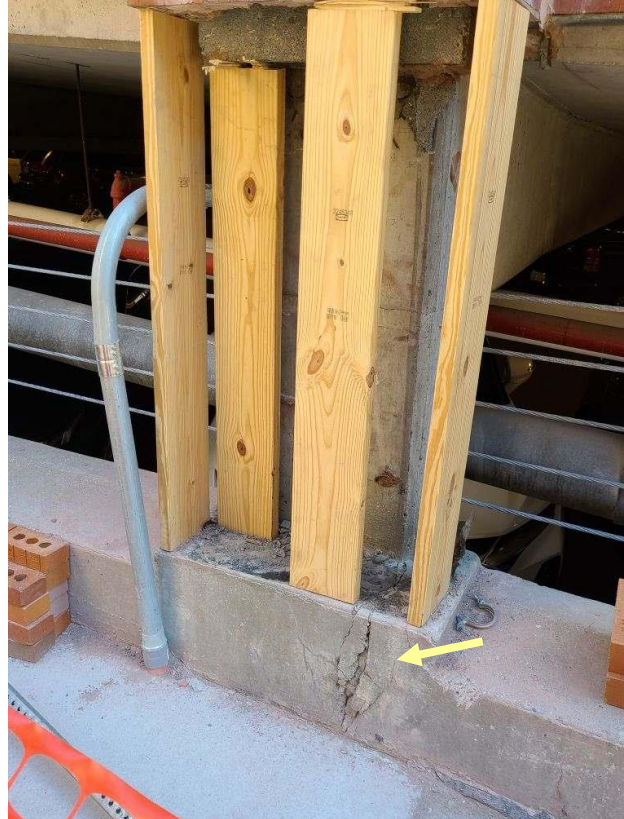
Column 12A inspection opening at Level 1 PT beam end (brick veneer removed, wood 2x installed as temporary support for brick). Note the concrete distress at the retaining wall.
